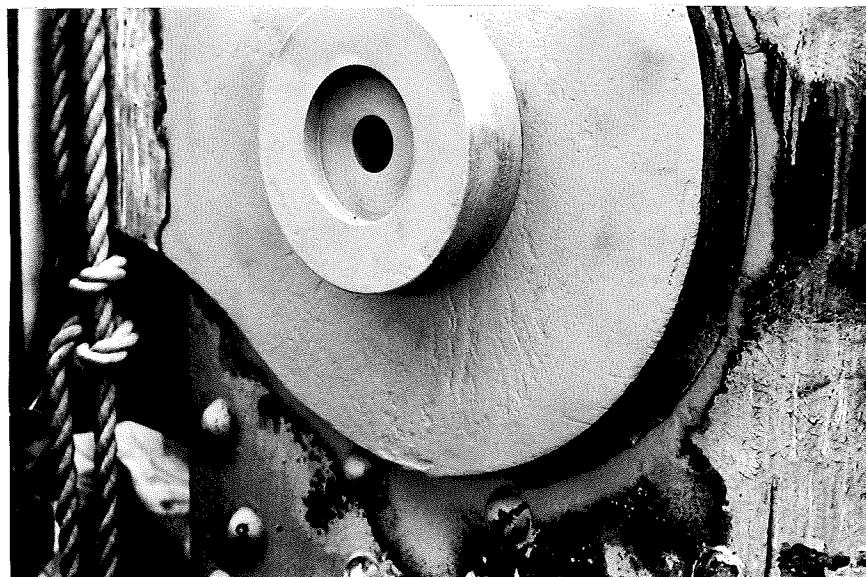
Sandblasted Eyebar Head Showing Forging Marks
